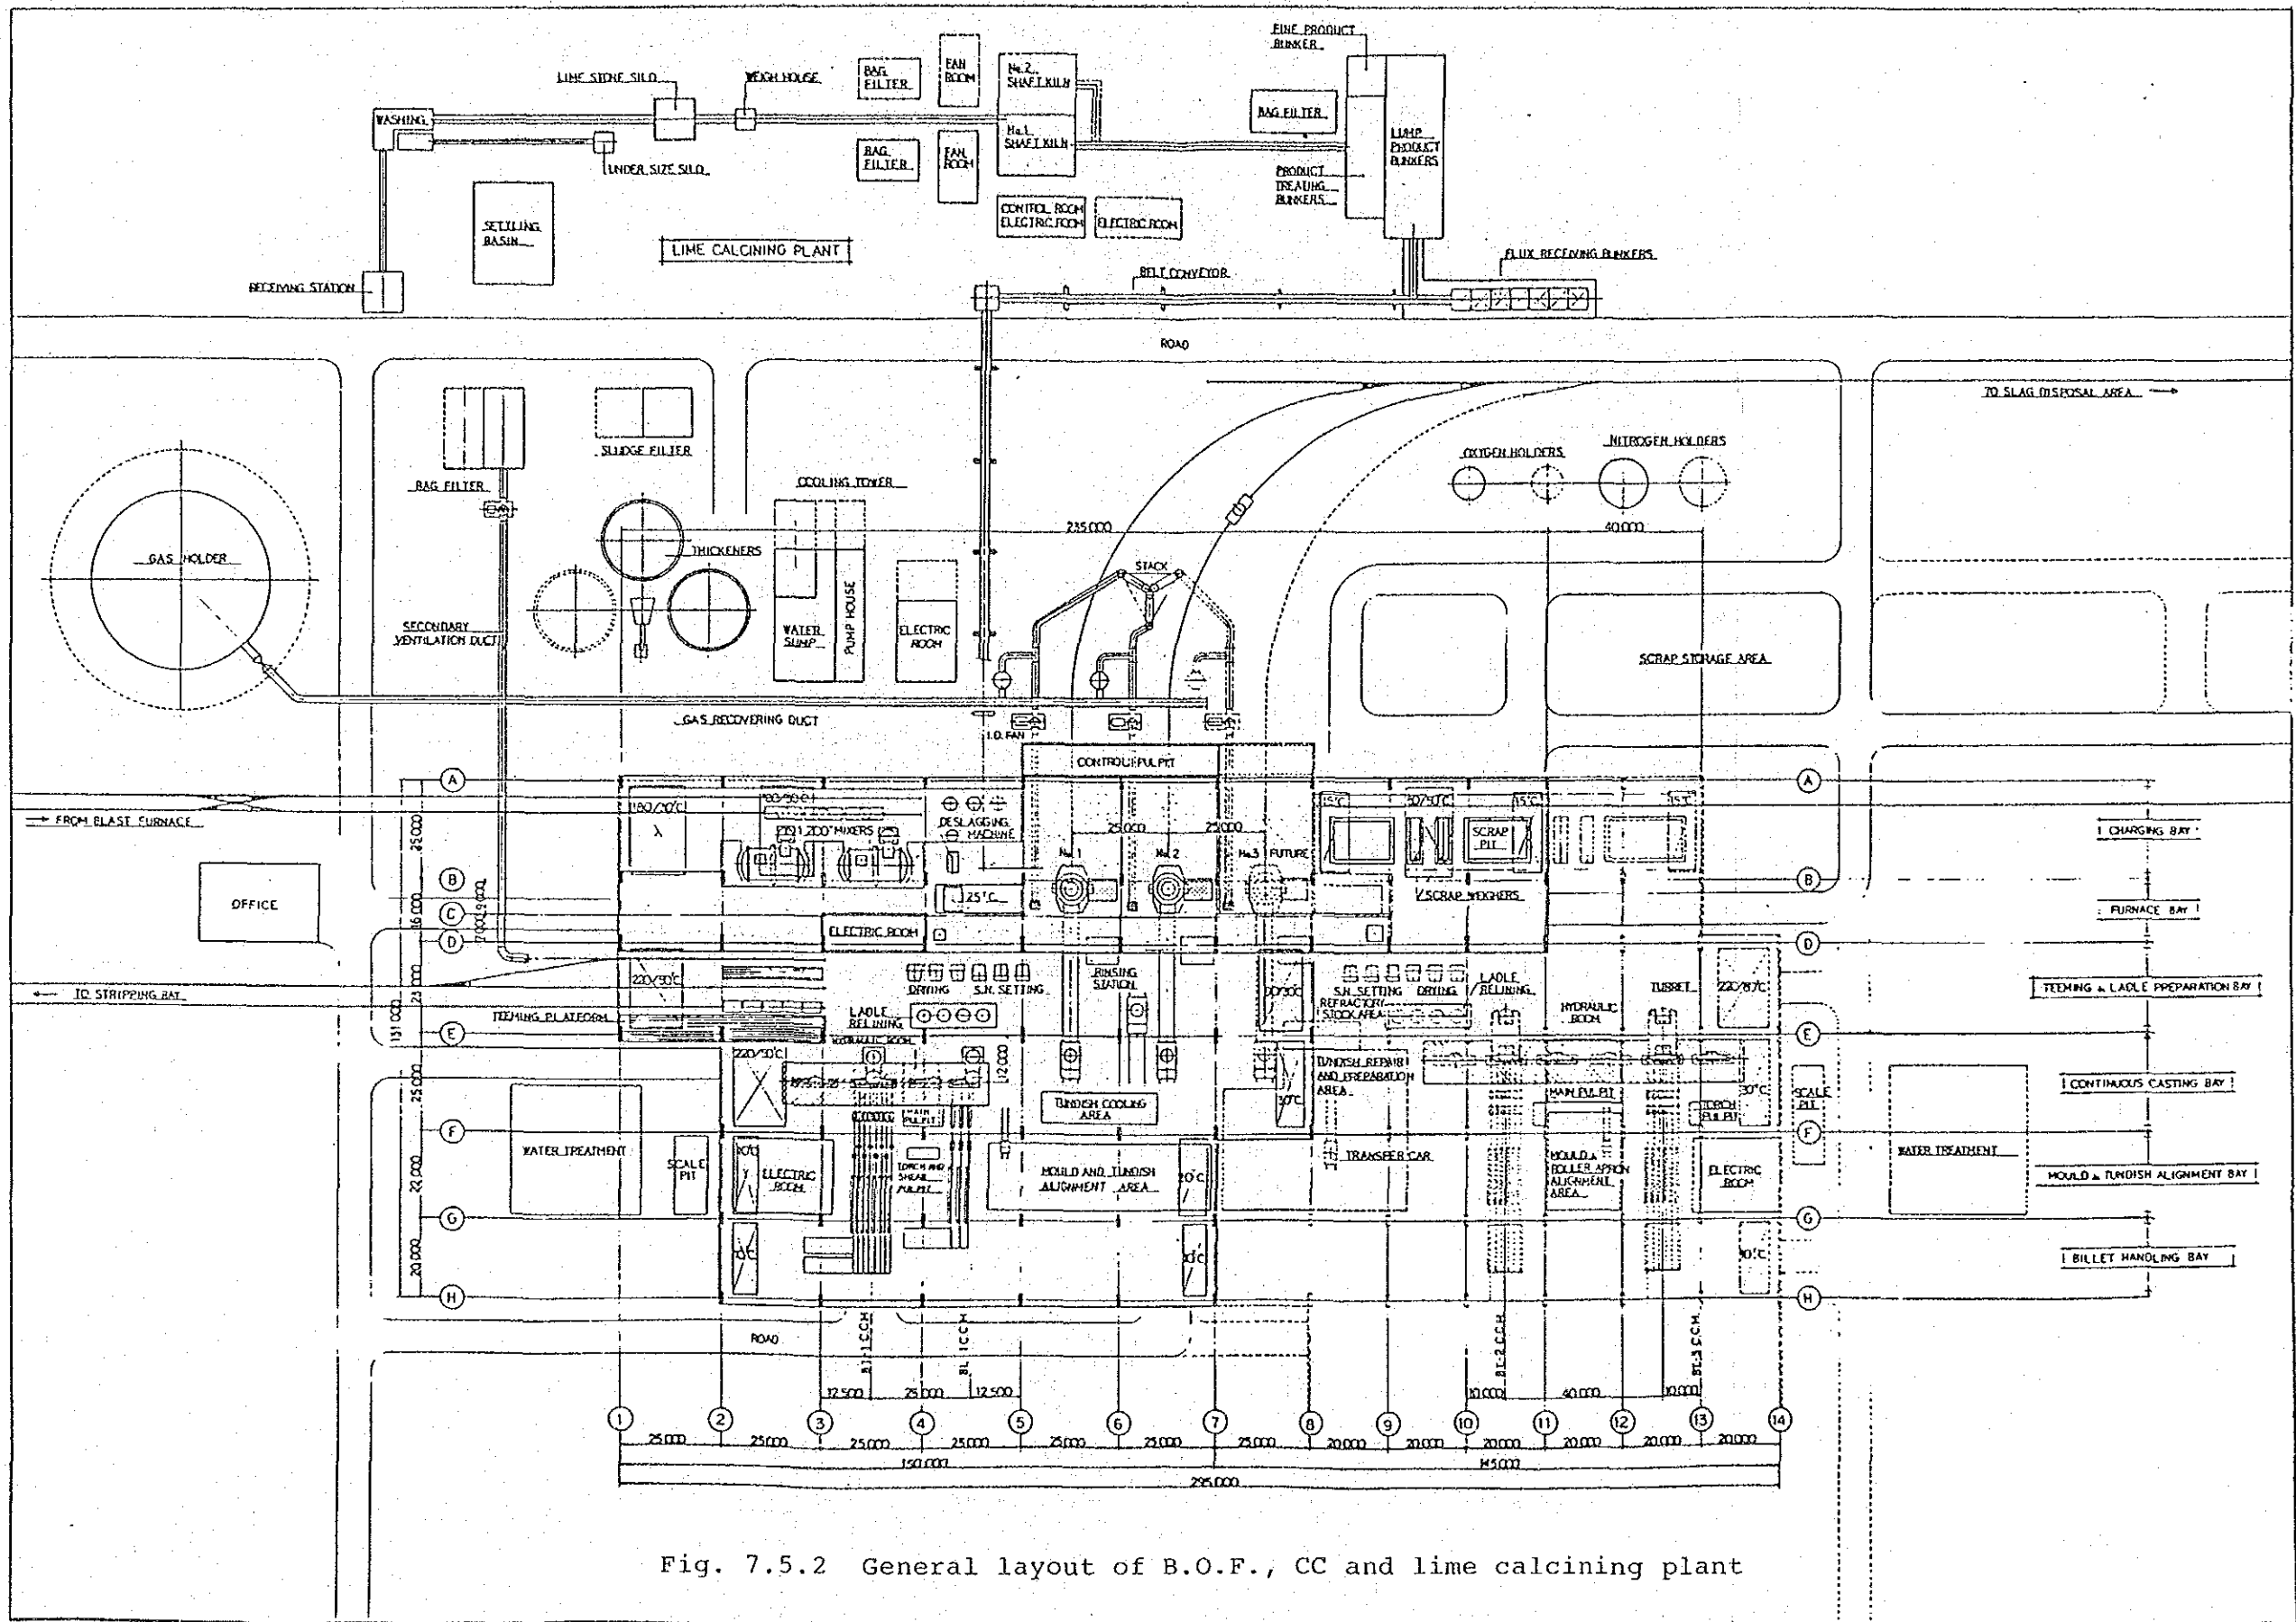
General layout of B.O.F., CC and lime calcining plant
